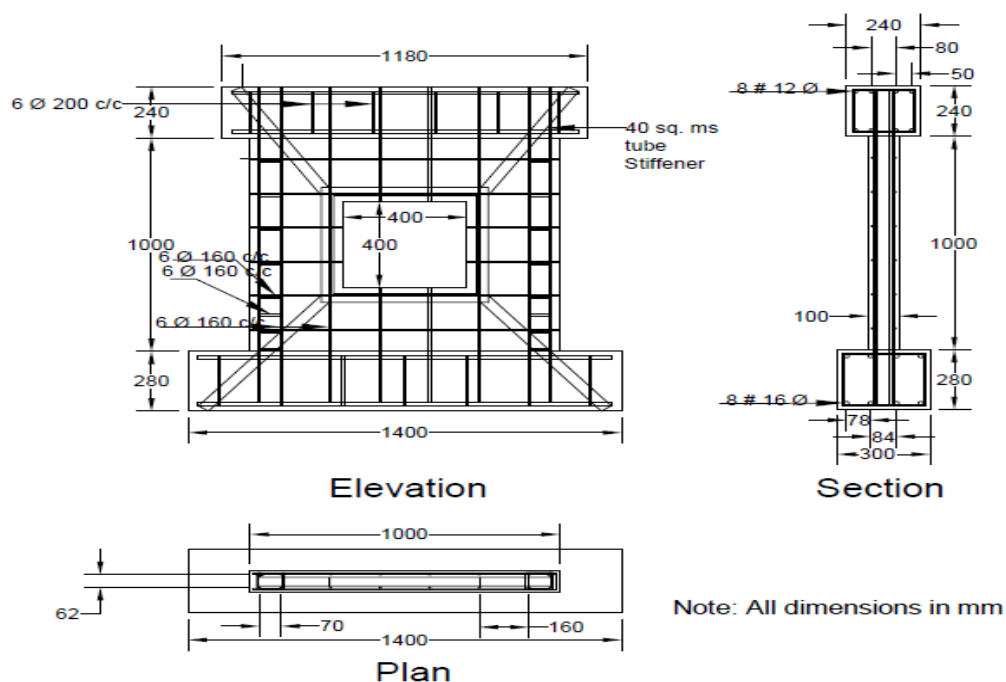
Shear wall having an opening with the provision of steel tube stiffeners (OPT)
